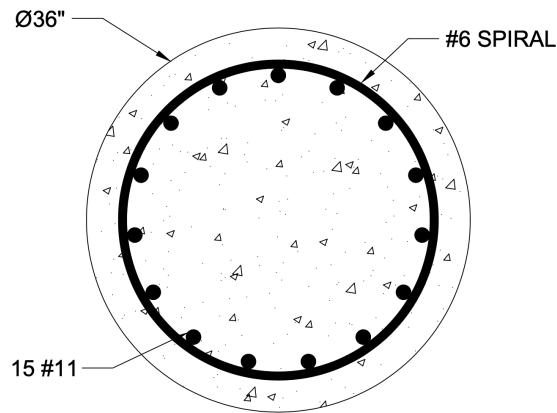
Spiral Reinforced Concrete Drilled Shaft Section.
